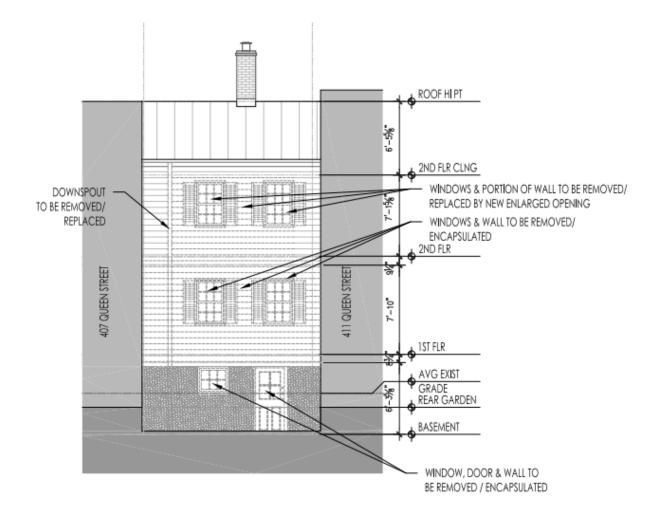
Drawing of existing rear elevation showing portions to be removed/encapsulated
